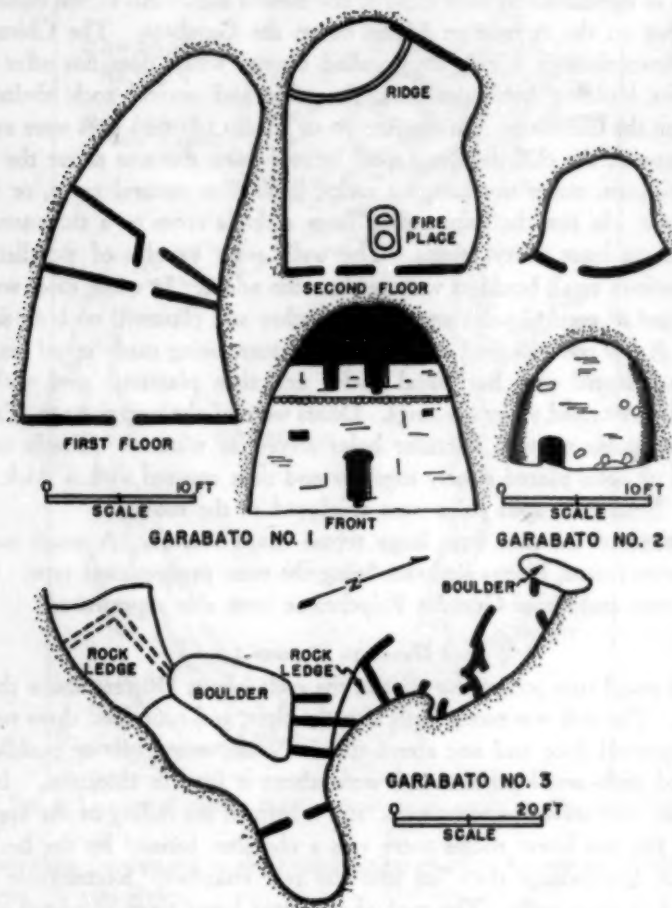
Sketch plans and façade of Garabato cliff dwellings.
